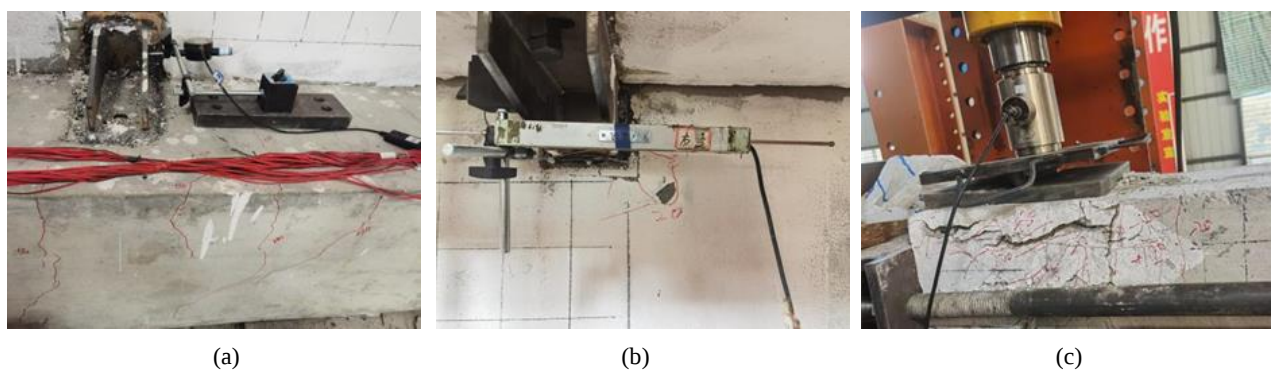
Crack patterns of specimen K2. (a) Connection between bottom beam and load-bearing joint, (b) Sliding connection joint, (c) Top of column.
